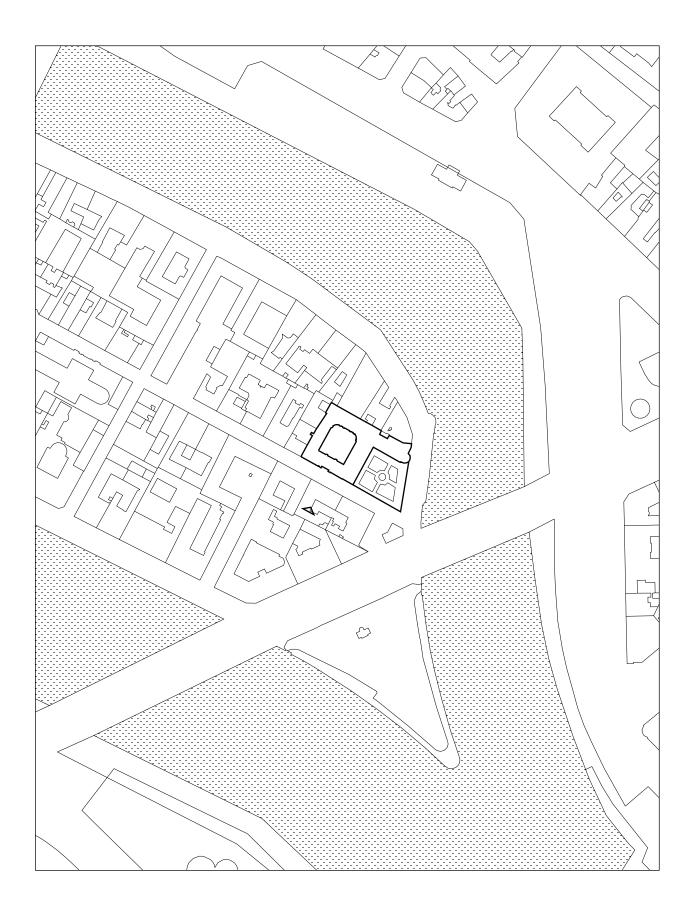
Site Plan of the Hôtel Lambert 1:2000
